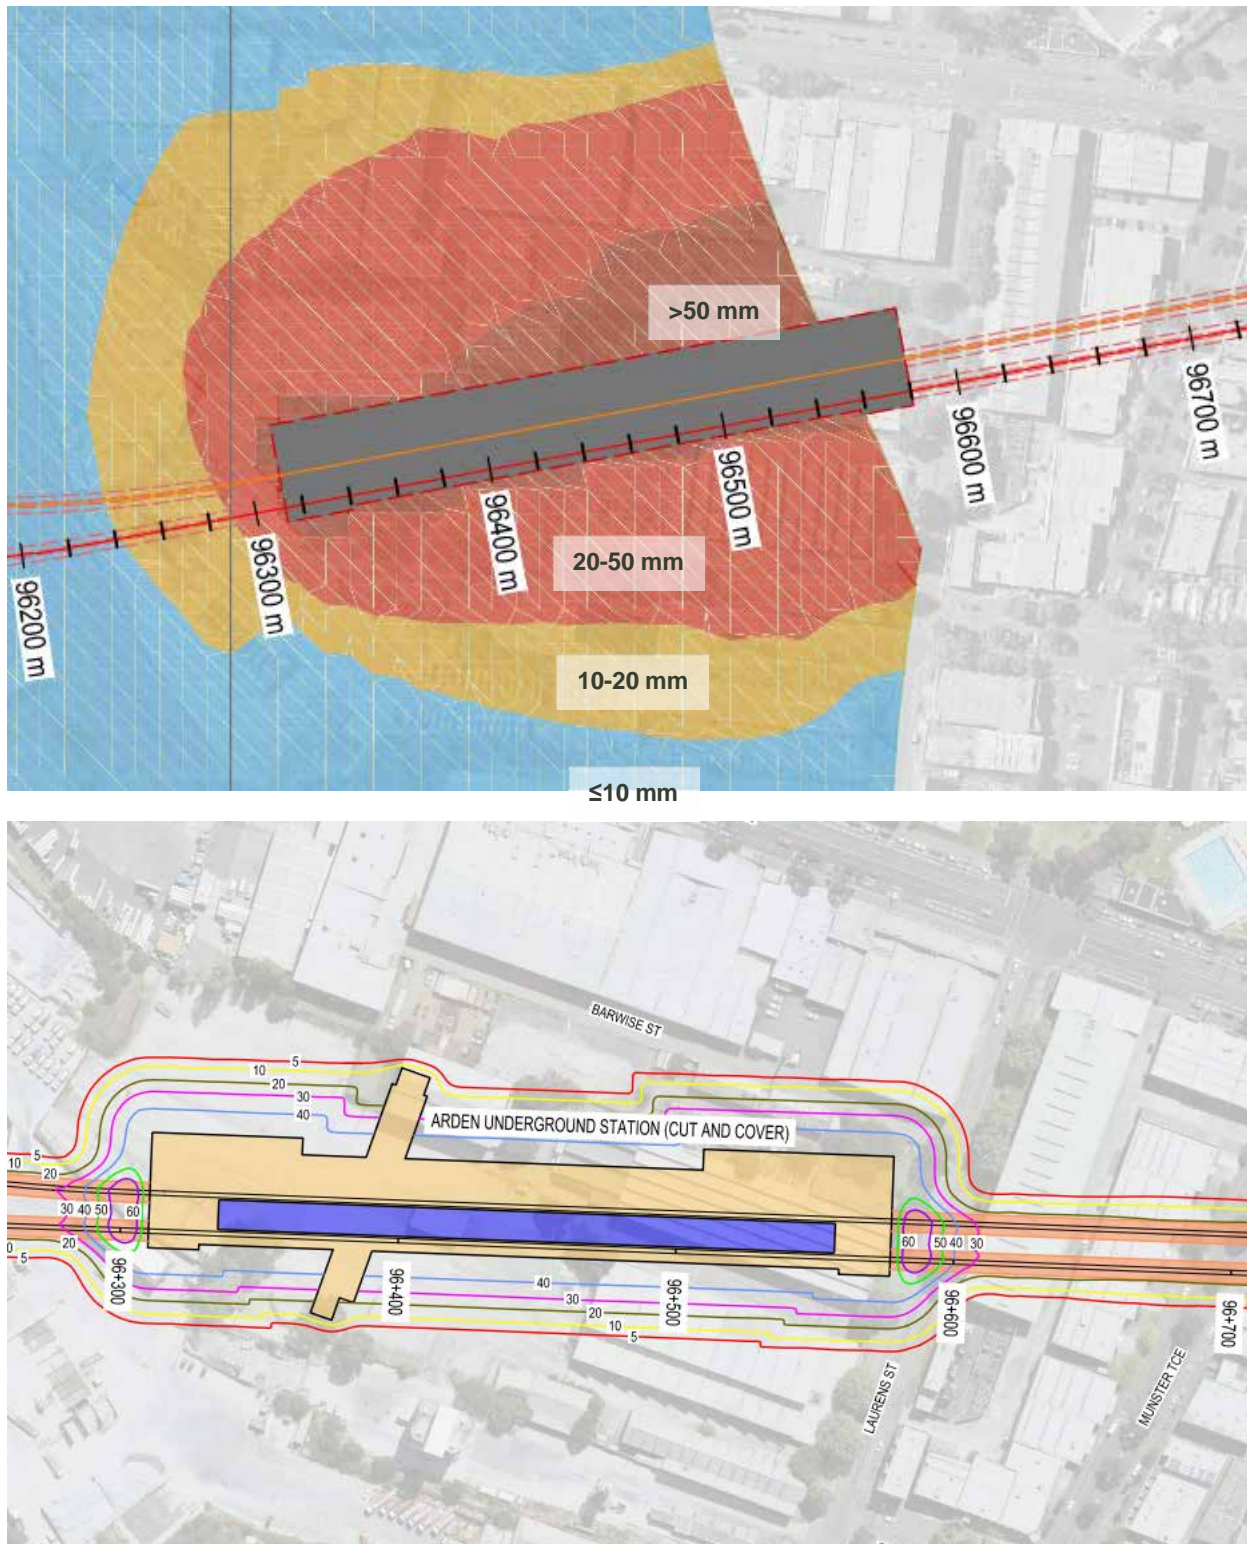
Arden station: Comparison of consolidation and excavation induced settlement
